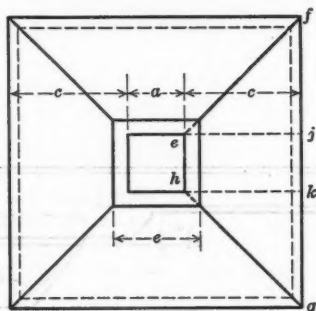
PRINCIPAL DESIGN SECTIONS OF A FLAT SLAB.
